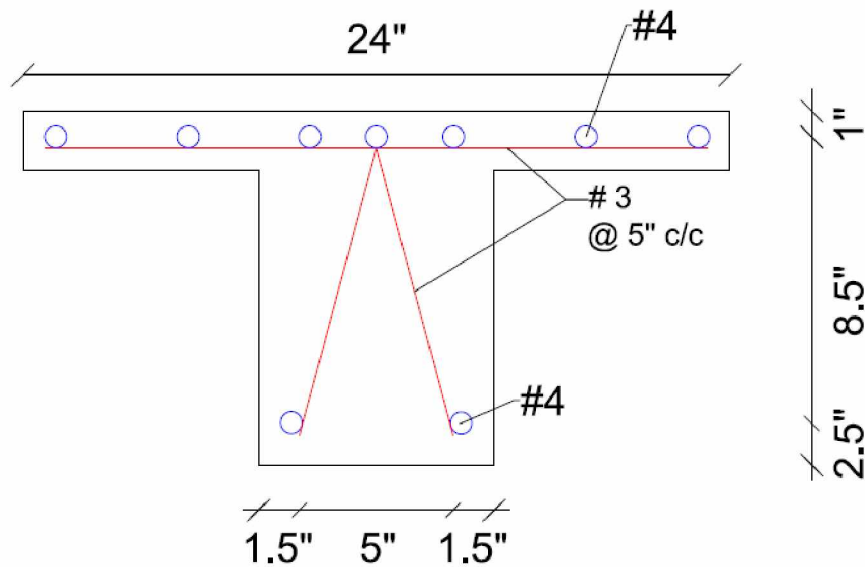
Cross Sectional Details of T- Beam TB1MS
